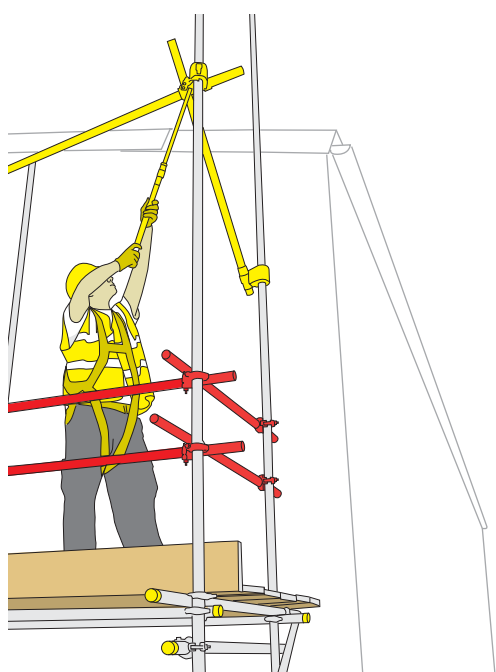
Push type Advanced Guardrail Tool (AGT) using special couplers and a positioning tool.
